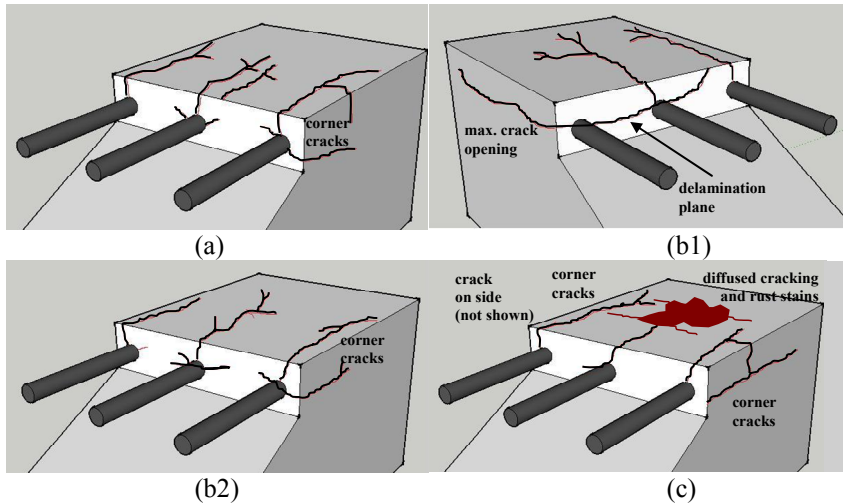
Crack patterns, Level 2: (a) with stirrups (not corroding); (b1-2) without stirrups; (c) with stirrups (corroding; diffused cracks on the top of the specimen not sketched, for clarity of the drawing)
